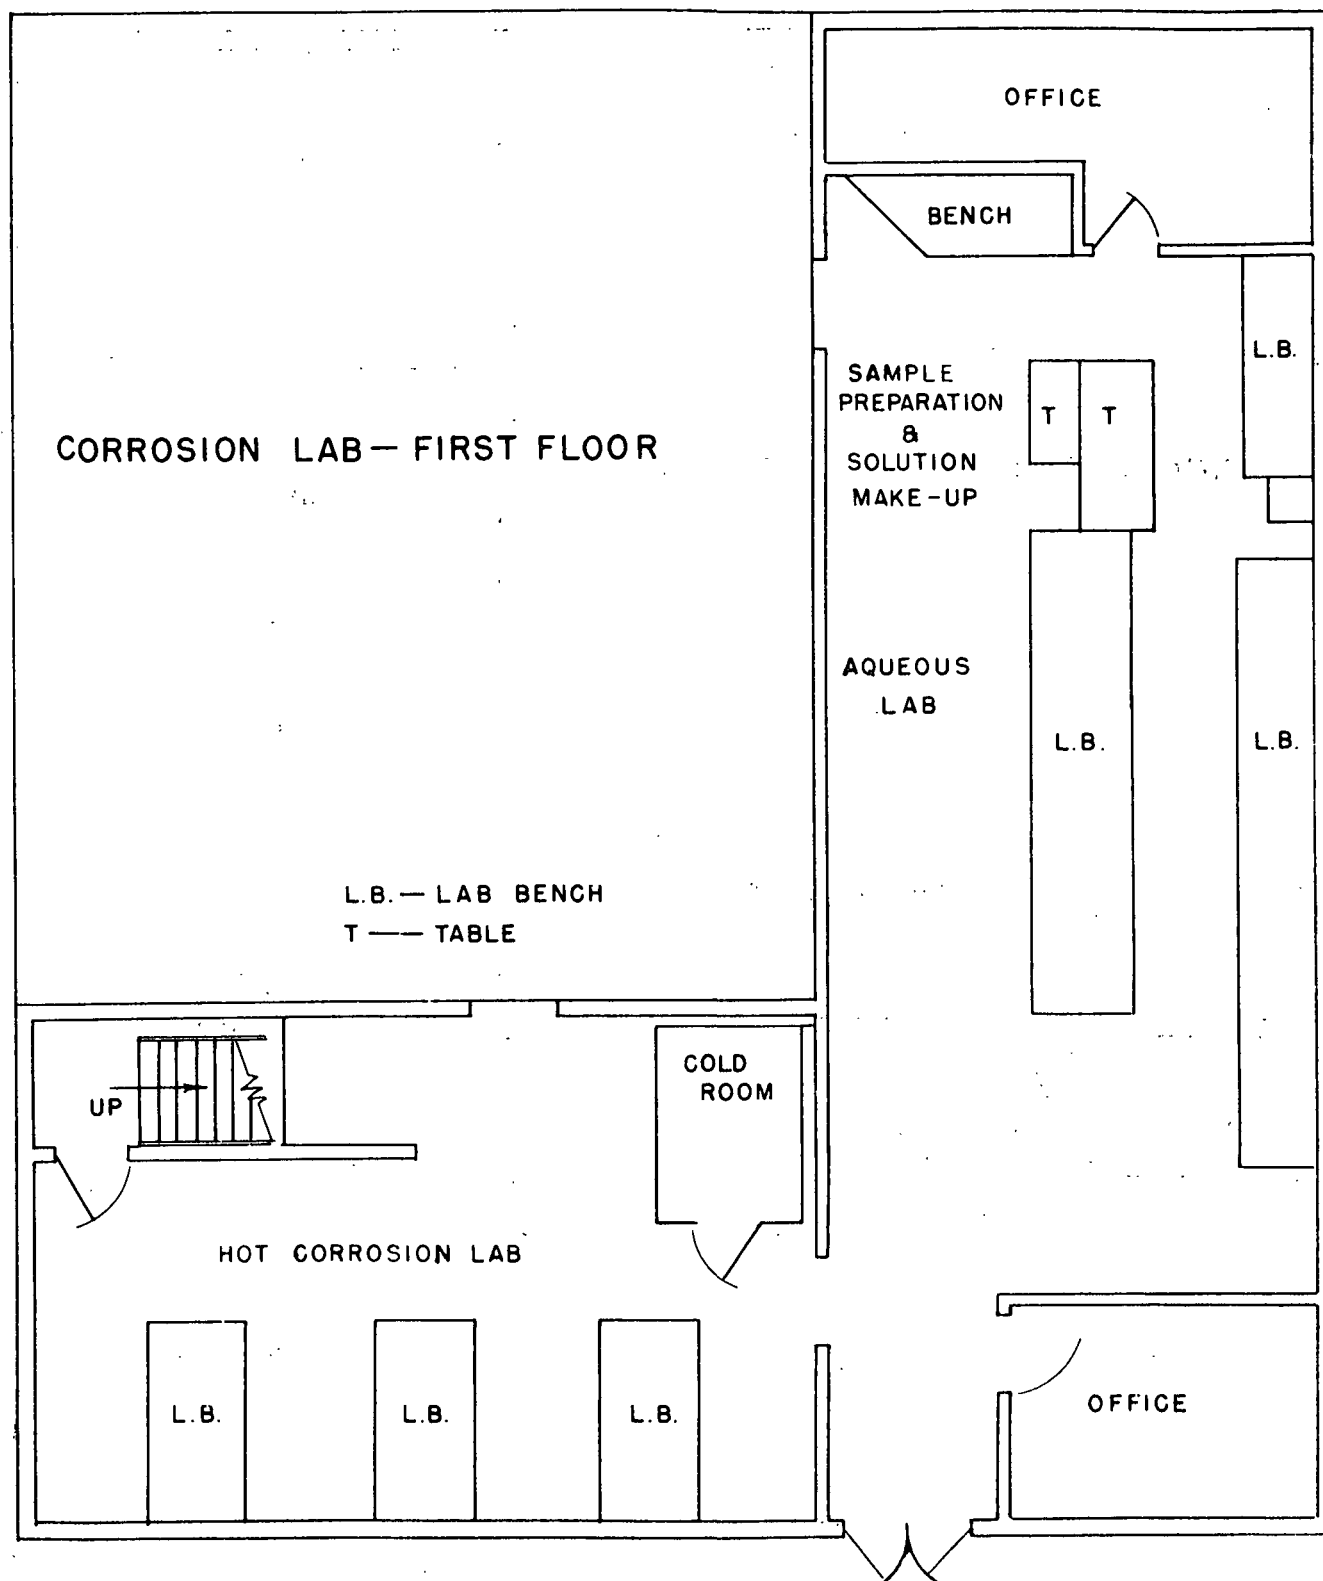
Layout of first floor plant of Annex Building showing the location of aqueous and hot corrosion lab facilities.
